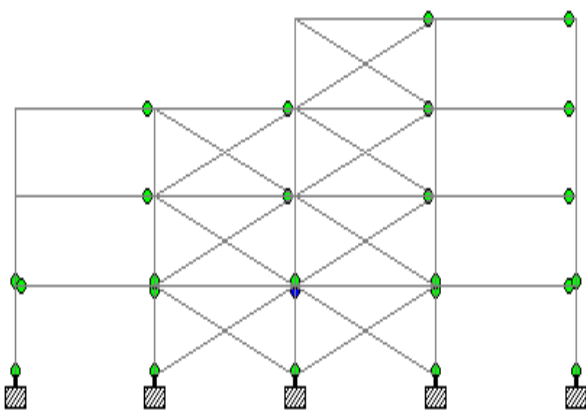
Members of Externally Braced Steel Frame in IO-LS
